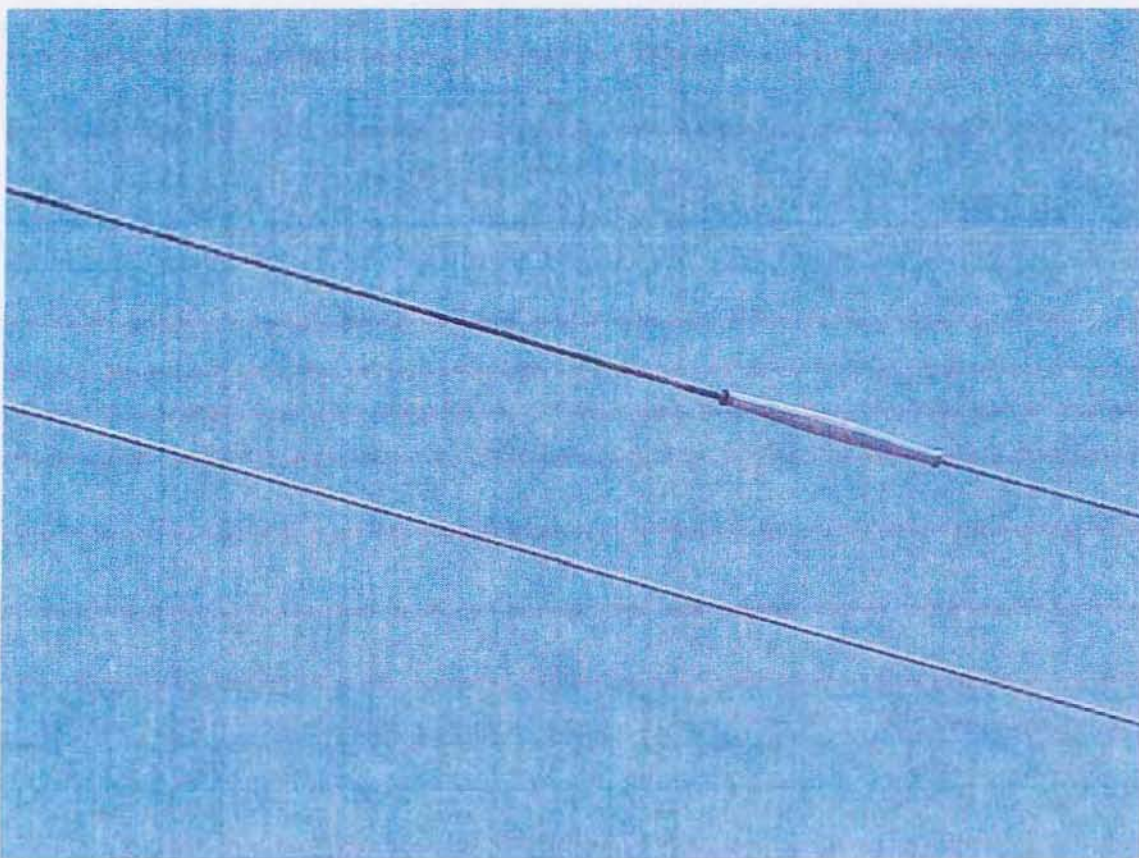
Next splice east of photo # 11 – apparent new conductor at right
